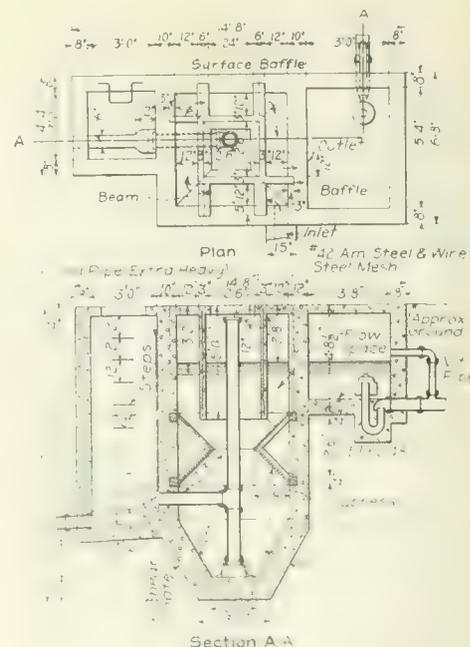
Plan and Section of Imhoff Settling Tank, Residence B.
